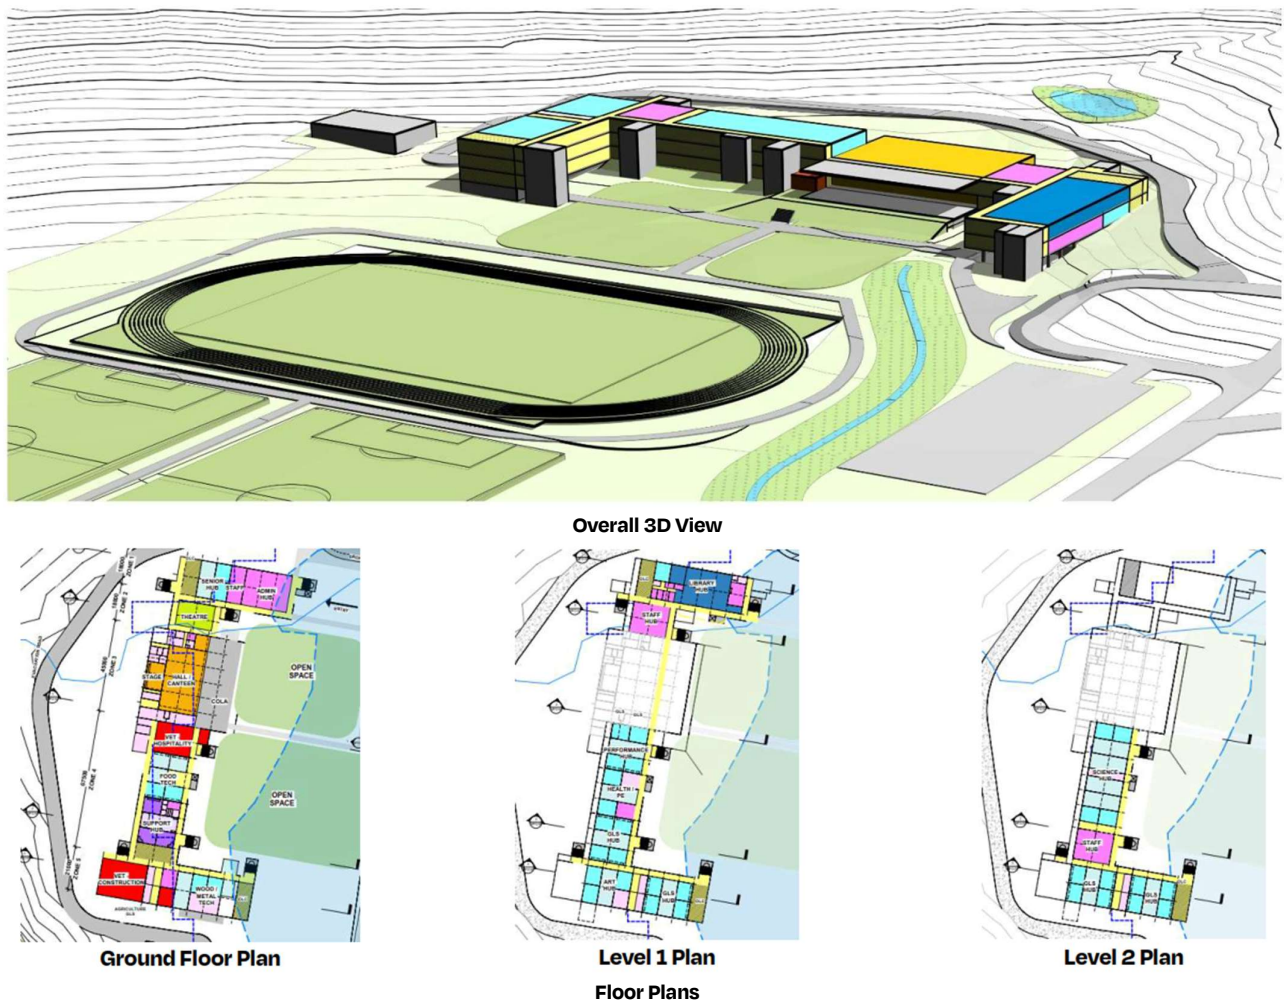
Dunoon Road Site Option 3 (Source – EJE Architecture)
